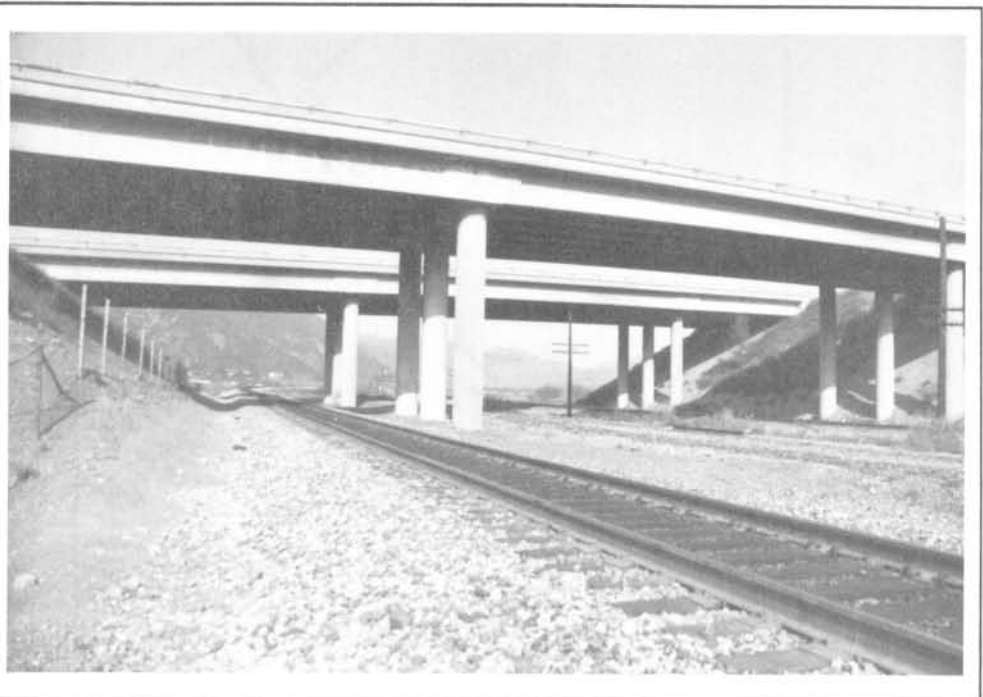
I-15 Bridge Over The Railroads In Cajon Wash
